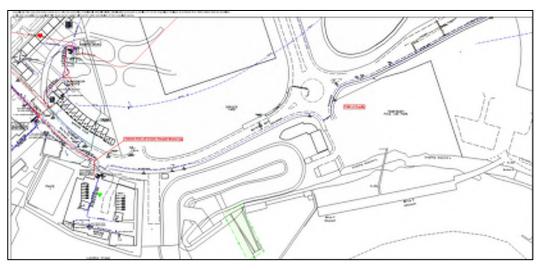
NGED 750kVA Point of Connection Plan within Watkiss Way
